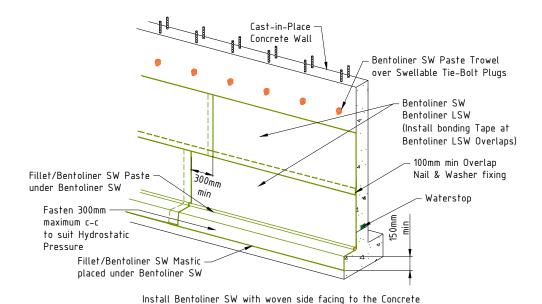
BentoLiner® SW installed on cast-in-place backfilled wall, overlap edges 100 mm and stagger vertical end laps
